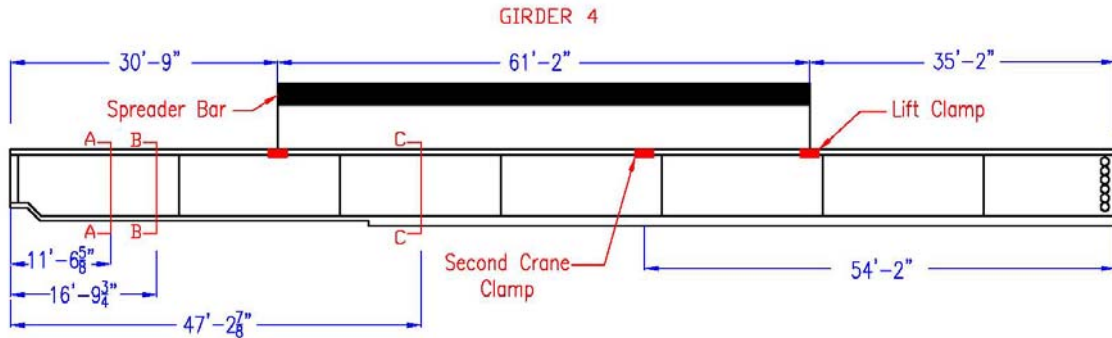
Girder 4 Lift Locations w/ Gaged Sections
